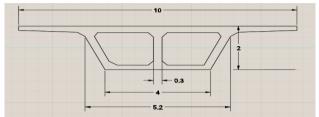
Cross-sectional details of trapezoidal box girder (all dimensions are in meter).
